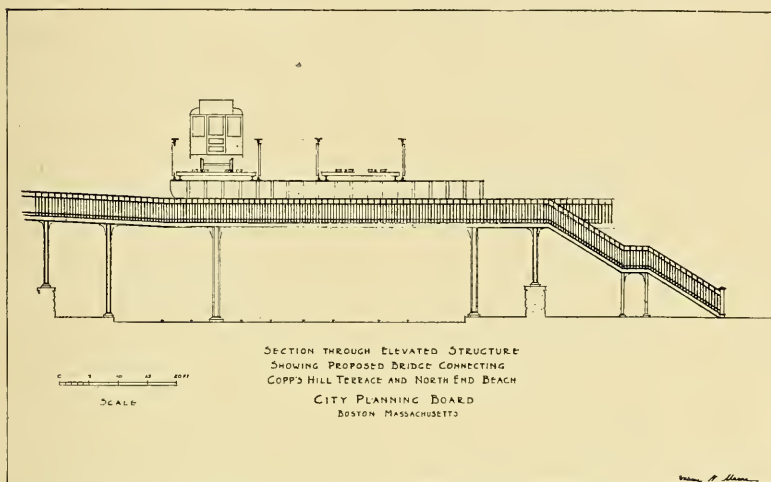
DETAIL DRAWING OF BRIDGE AND ELEVATED WALK FROM COPP'S HILL TERRACES TO THE NORTH END BEACH.
